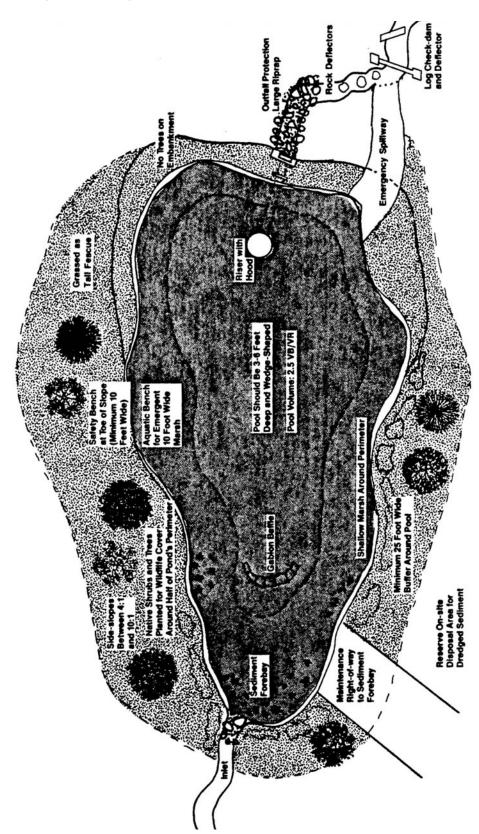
Design Schematic of a Wet Detention Facility (Schueler, 1987)
